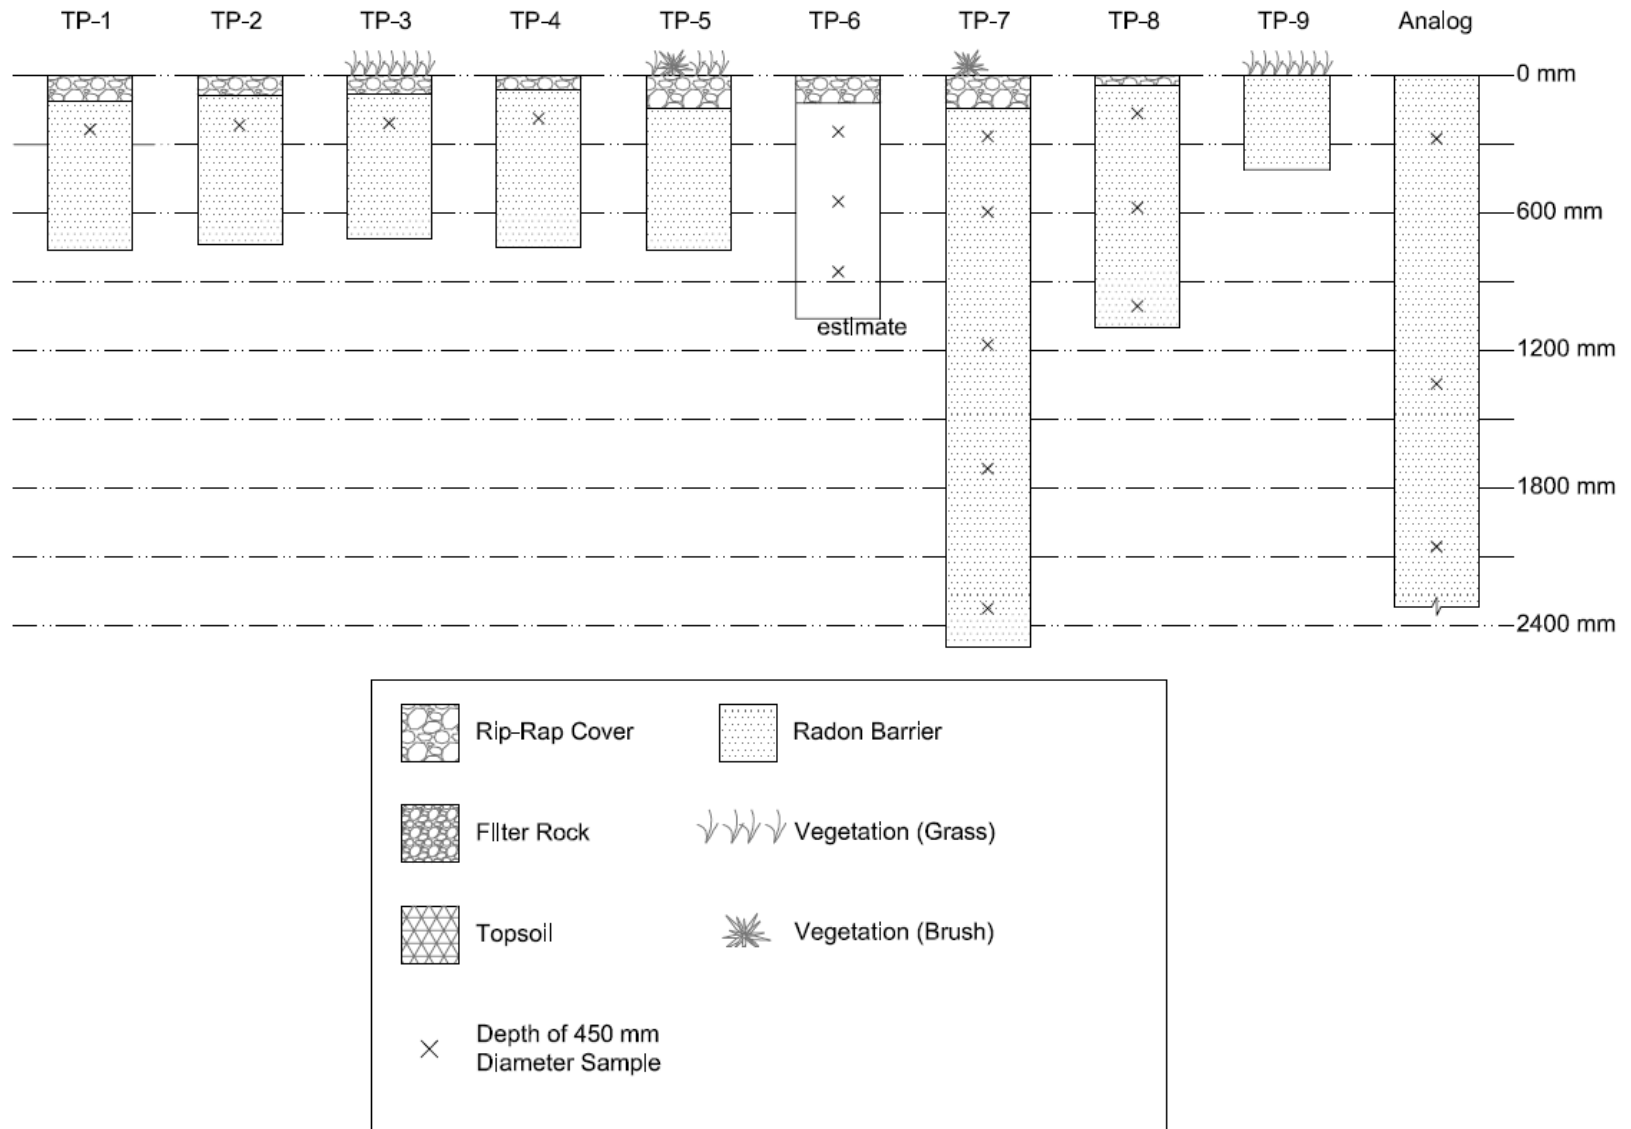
Cover profiles at each test pit excavated at the Bluewater, NM site in 2016.
